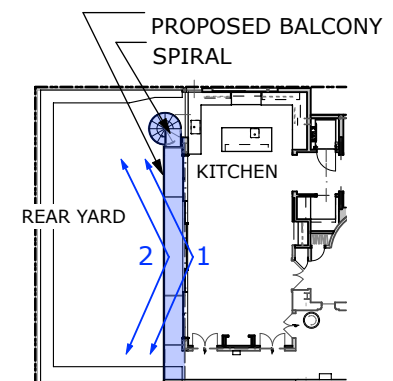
PHOTO LEGEND: PARTIAL PLAN @ 2ND FLOOR
